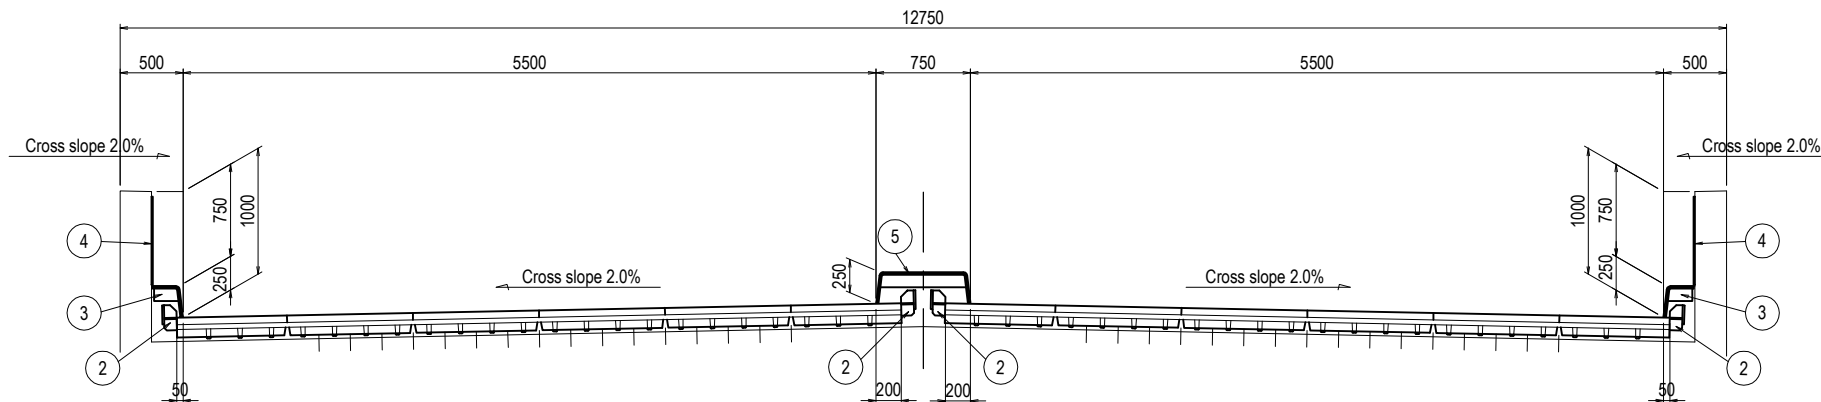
# DETAIL OF EXPANSION JOINT (PF7-PF11) (2)
